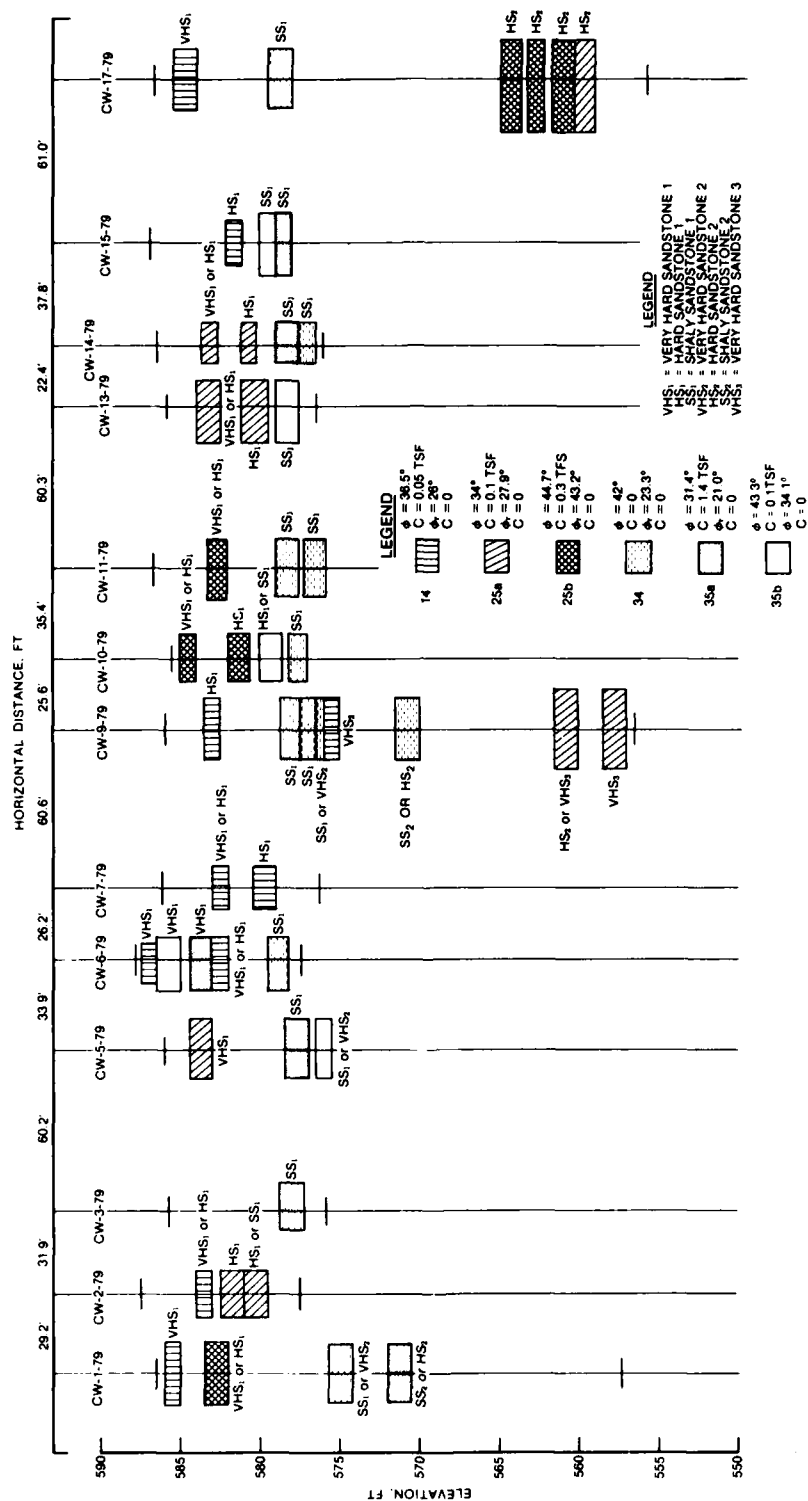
Location of clay and shale seams in downstream section (Section D-D', Plate D1) of core holes
